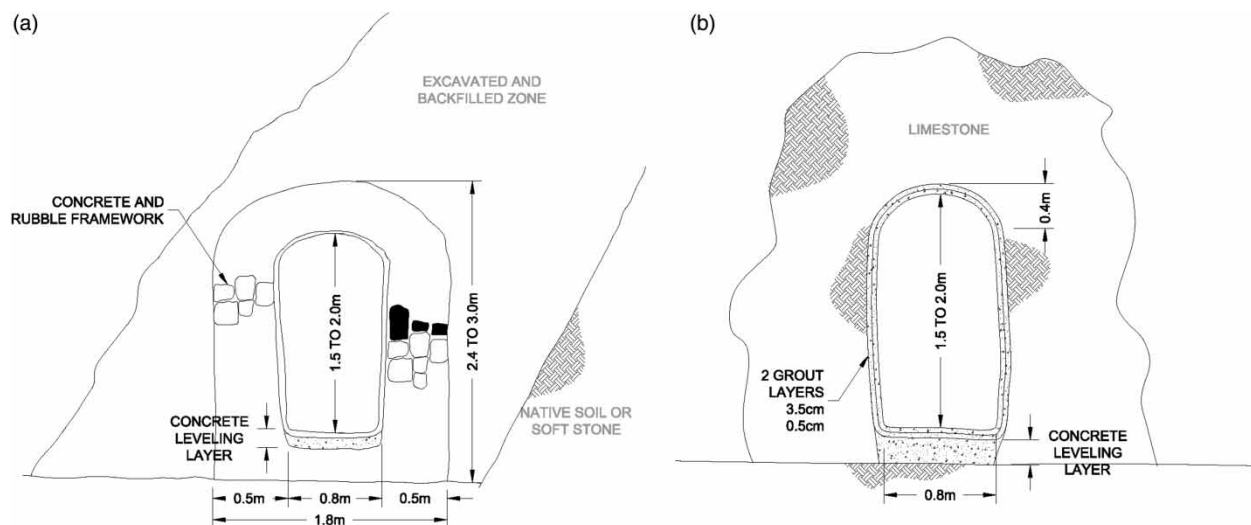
| (a) Cut and cover bench into hillside section. (b) Deeper tunneled section.
